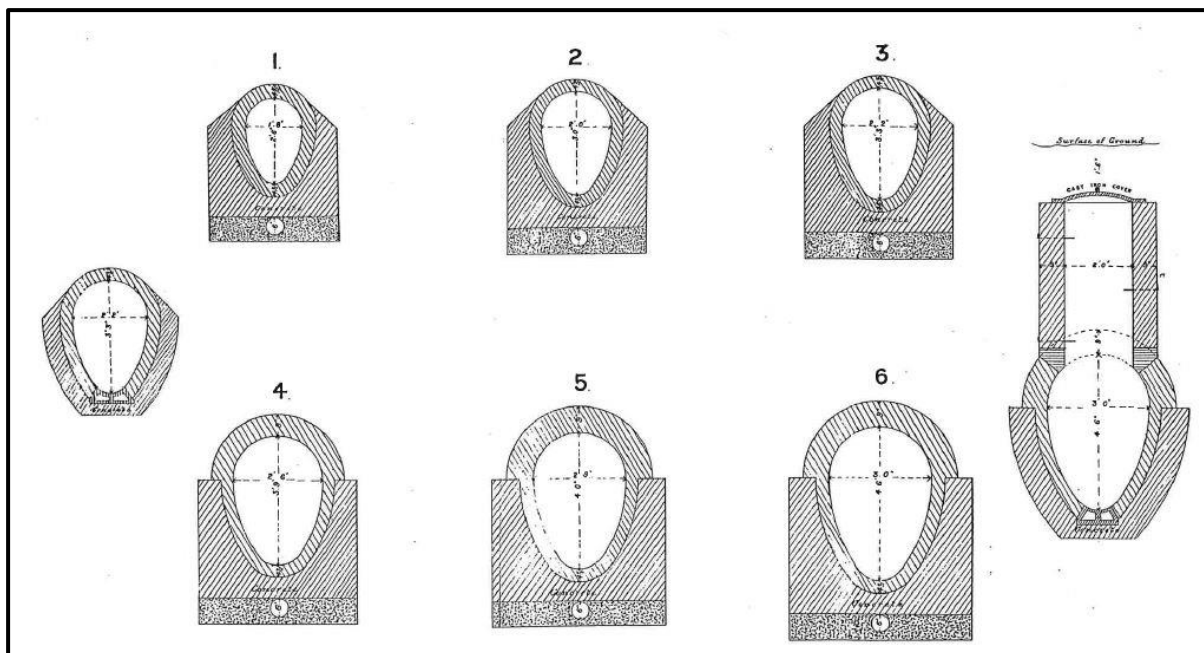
Examples of the oviform brick and concrete sewers designed by drainage board engineer William Clark. Image: Clark 1878.
